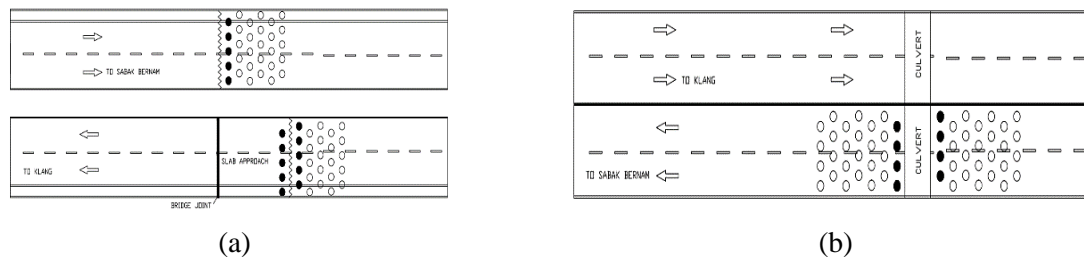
The area injected with PU foam at (a) Sultan Salahuddin Abdul Aziz Bridge (both direction of one of abutment); and (b) Culvert at Sg Gulang – Gulang (Route from Klang to Teluk Intan).
